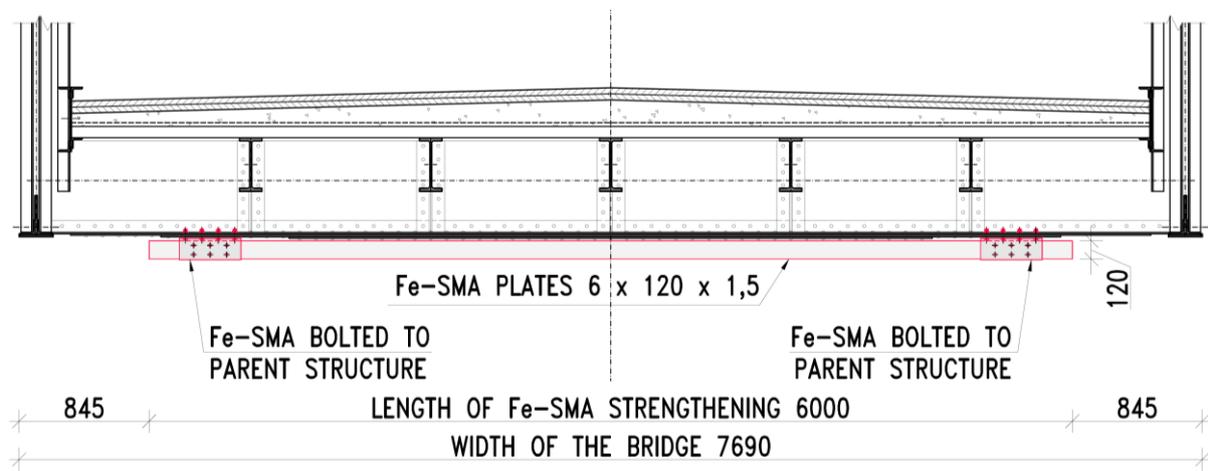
Cross-section of Petrov bridge deck with Fe-SMA strengthening
